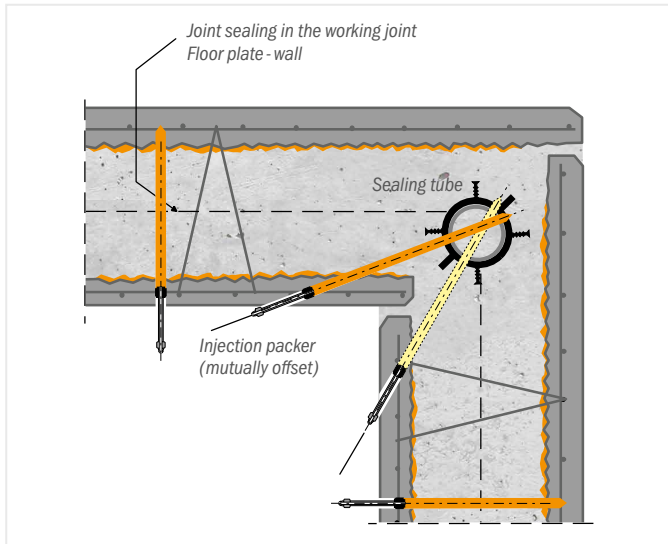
Subsequent sealing of an element wall ceiling with sealing tube by injection [7]
